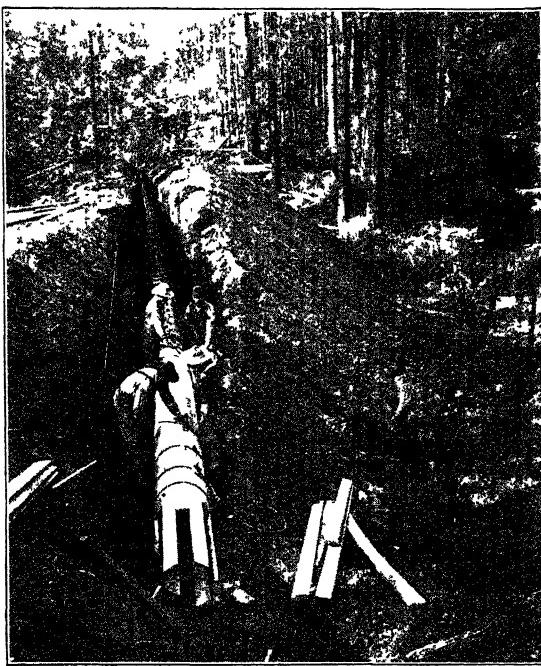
Erecting a 12-Inch Pipe of California Redwood
